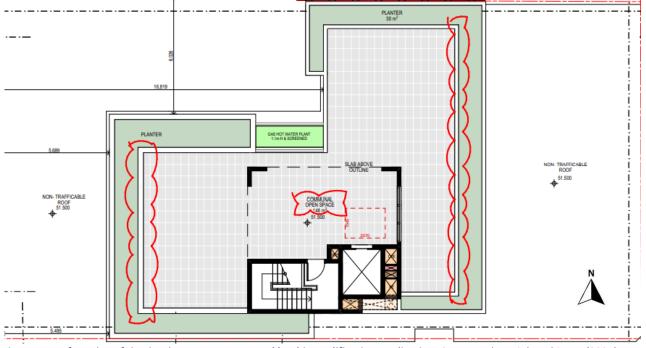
Rooftop plan of the development, as proposed by this modification application. Source: Urban Link Architects (2024).
